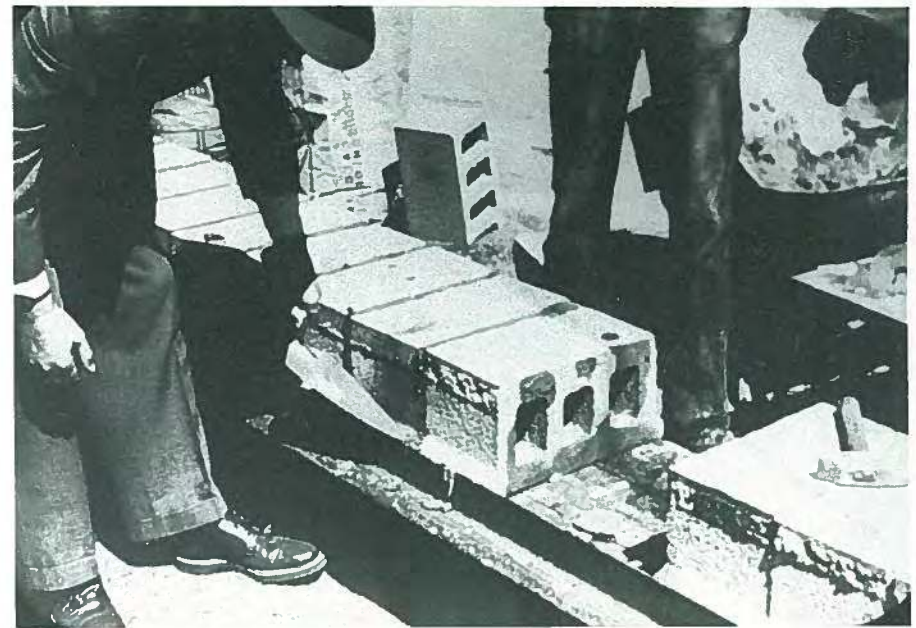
Fabricating 8-in. (203 mm) block building beam.
